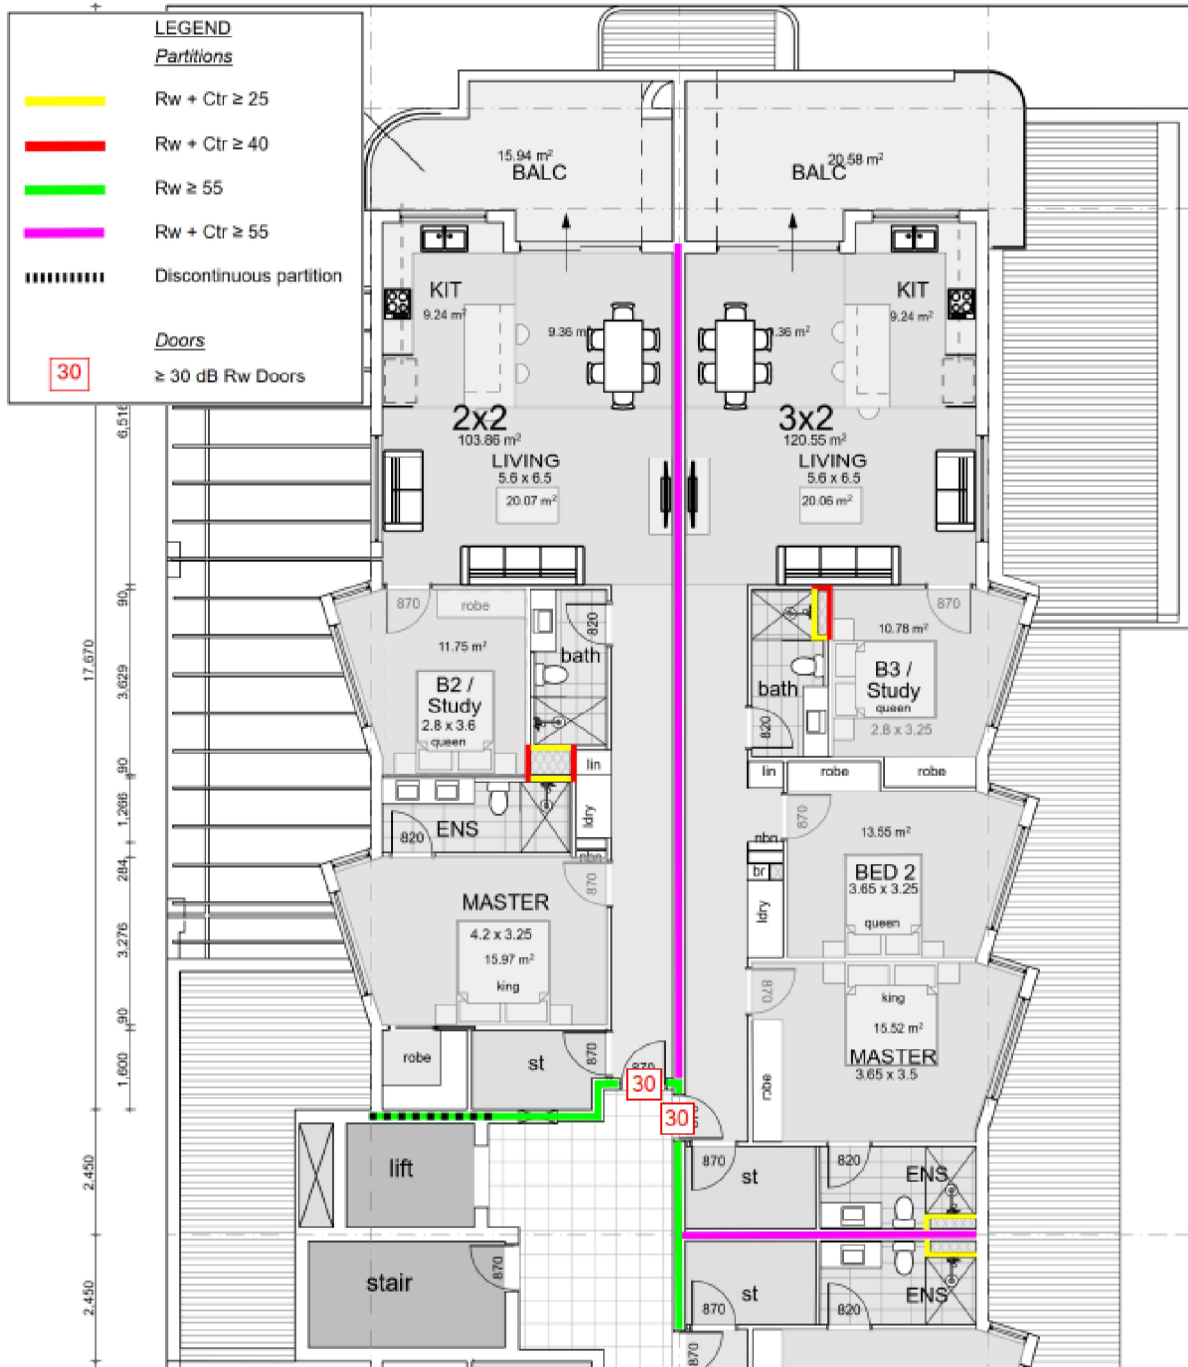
Sound insulation wall markup. Levels 1 -5, south.
